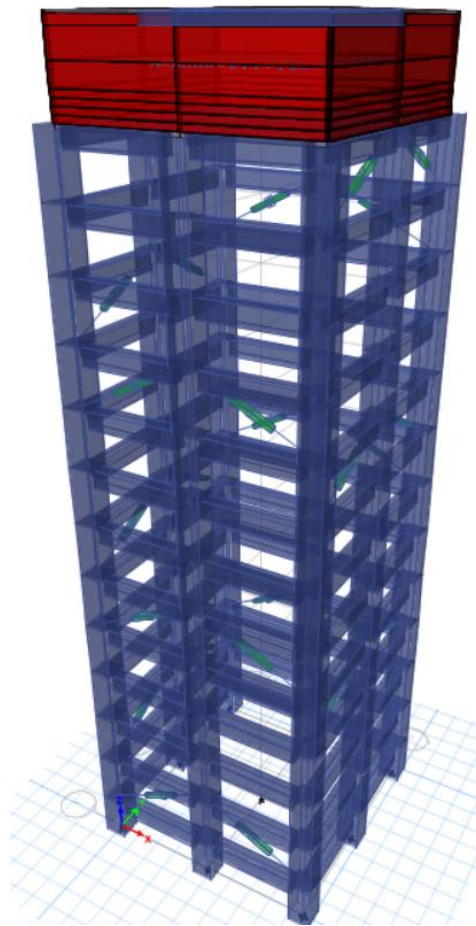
3-D View of 12 Staging Elevated water tank with FVD
